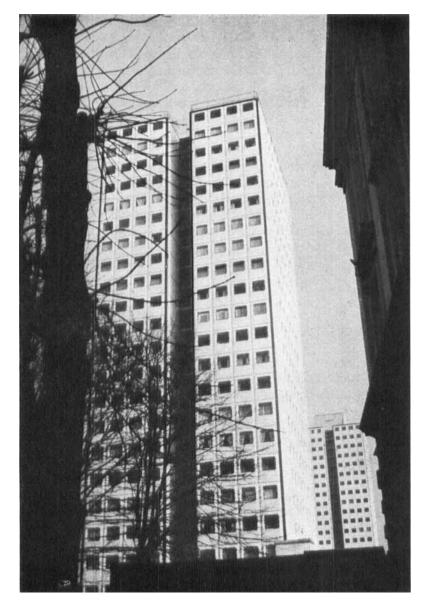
Wall panels, apartment building sandwich panels have molded glass fiber reinforced polyester outer facings with baked urethane coating. Core is foamed concrete, and inner facing is reinforced gypsum. (Greater London Council)
